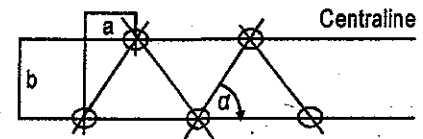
C — REGULAR SAW-TOOTH PATTERN OF HOLES
